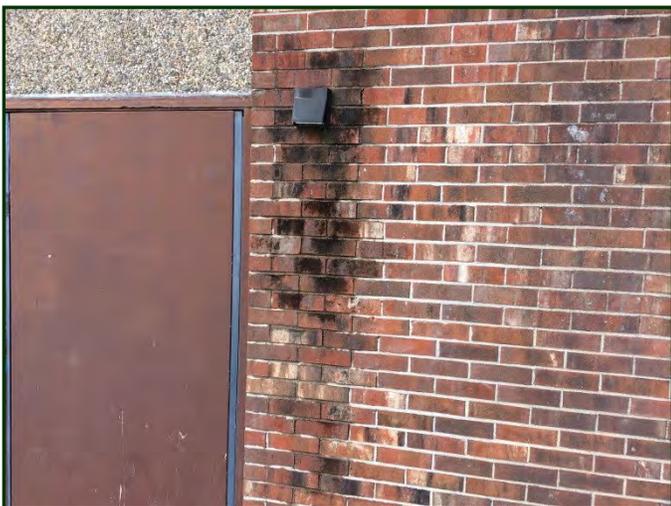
Evidence of potential water infiltration at a light fixture adjacent to the door on the south façade of the
